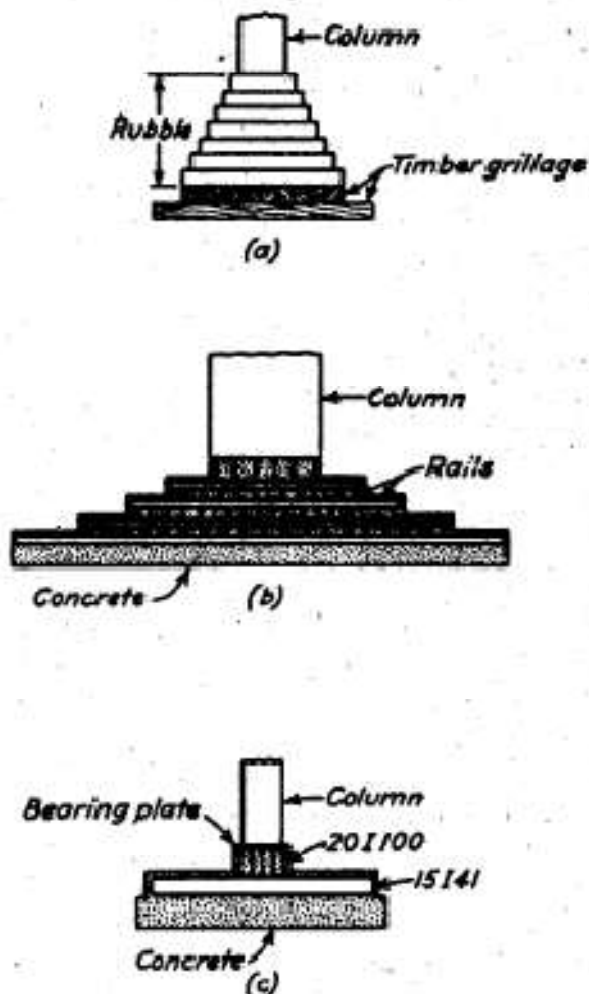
Historical development of grillage foundations of (a) timber, (b) railroad rails, (c) steel I-beams.
